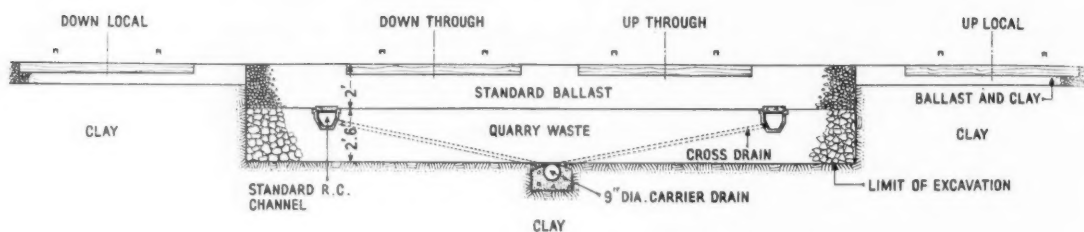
Typical cross-section of blanketing at Paddock Wood
